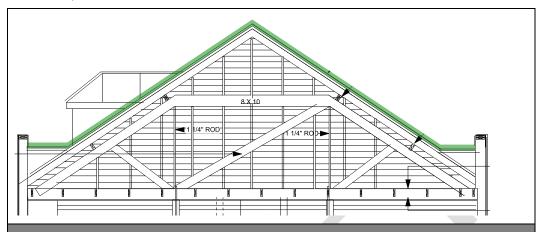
Example of an exterior insulated roof approach, with the plane of the insulation shaded green on a partial section drawnig of the roof (drawing underlay source: Keay Architecture Ltd.).
